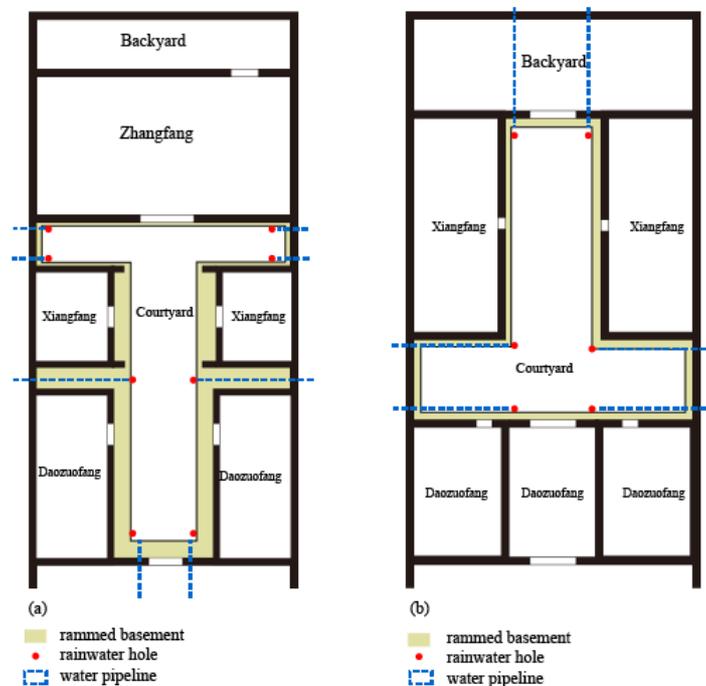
Layout of traditional residential buildings of Heyuan in Guanzhong
